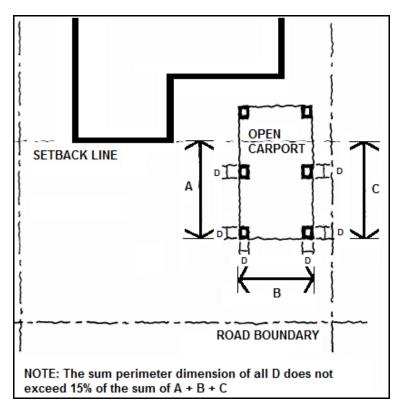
Example setbacks for an existing dwelling house in the Rural Zone
